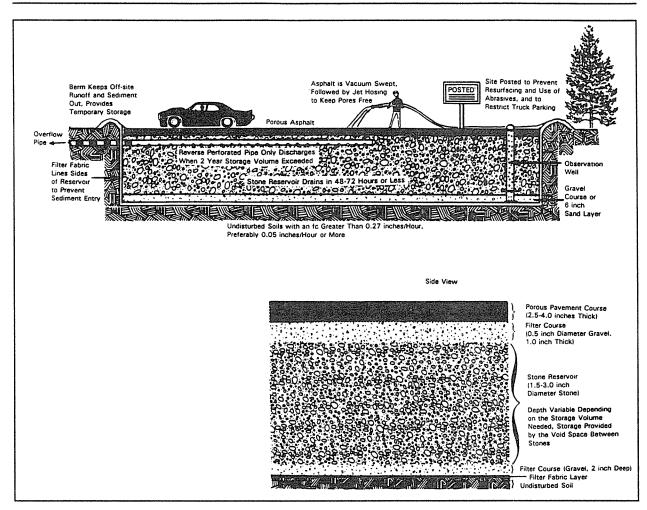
Schematic design of a porous pavement system (Schueler, 1987).
